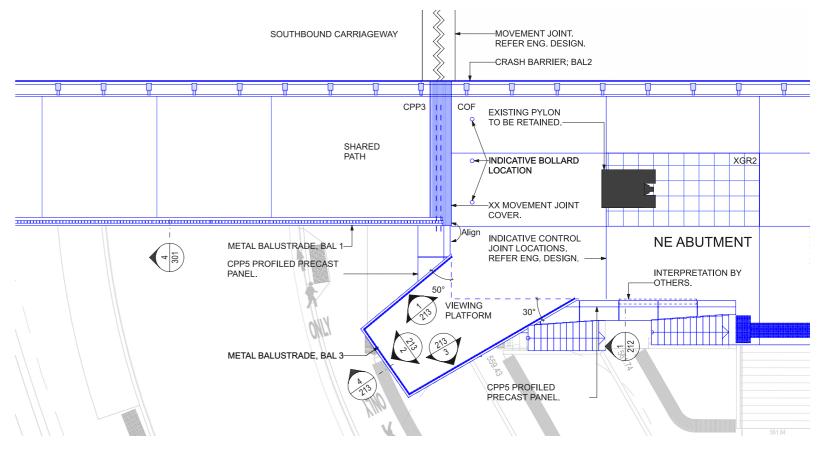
NE Abutment and Lookout Plan (Scale 1:150)
